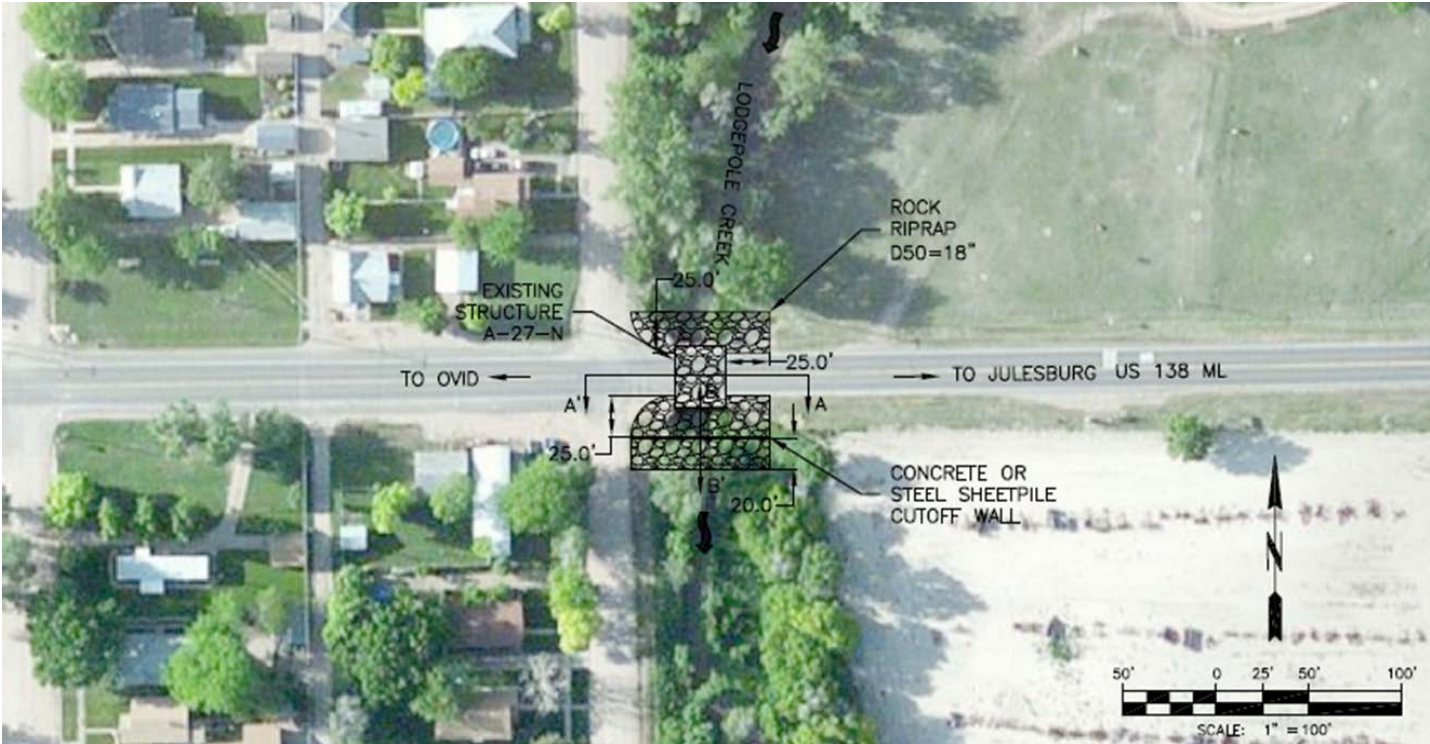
Plan view of Bridge A-27-N with recommended hydraulic scour countermeasure locations
